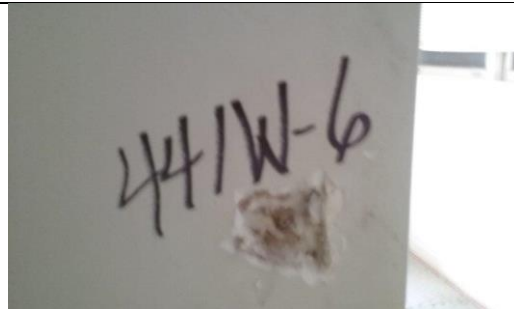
Drywall/J.C. (441W-6) Dining Room, Wall A.
